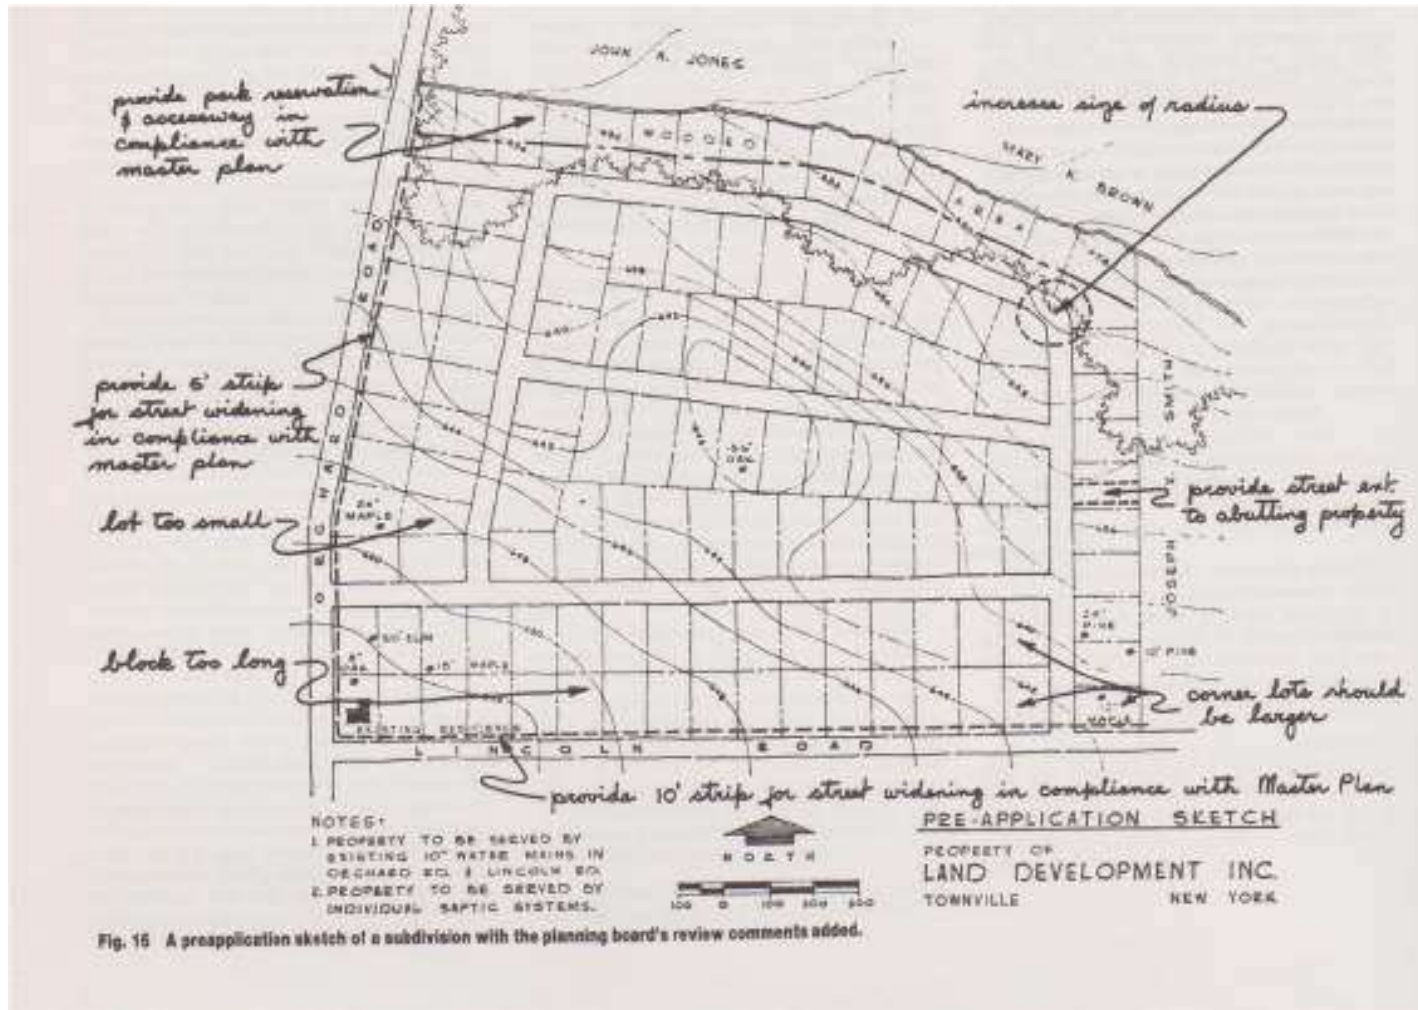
A preapplication sketch of a subdivision with the planning board's review comments added.
